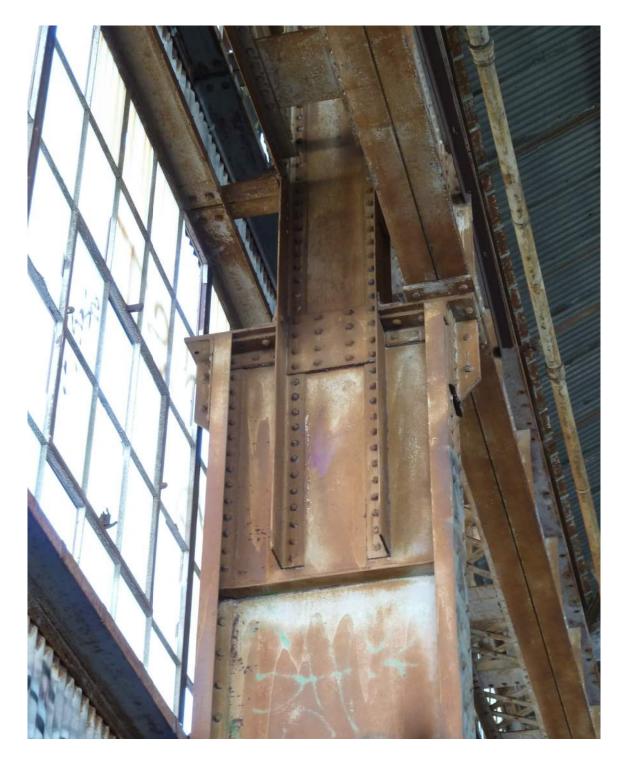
Typical Column Splice Connection at Crane Track Support
